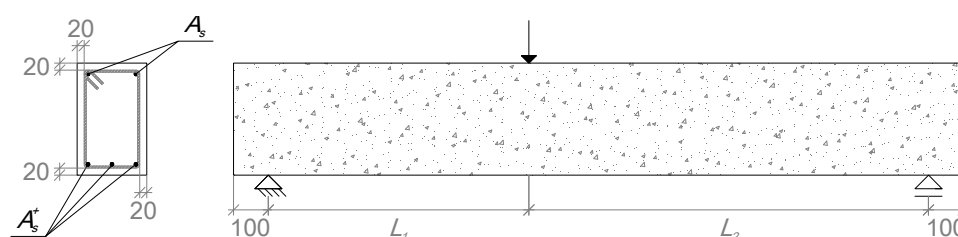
Geometry and loading conditions of the tested beams – dimensions in millimetres.
